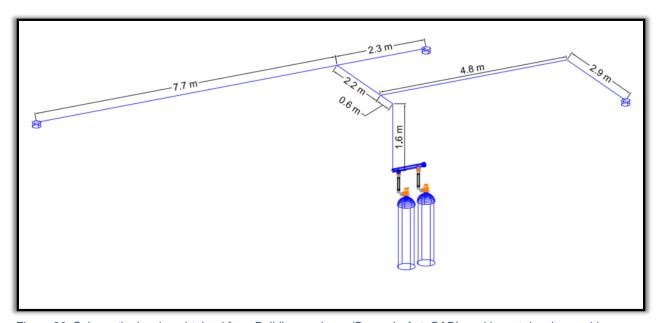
Schematic drawing obtained from Building engineer (Drawn in AutoCAD), real layout drawing could very well be a hand sketch
